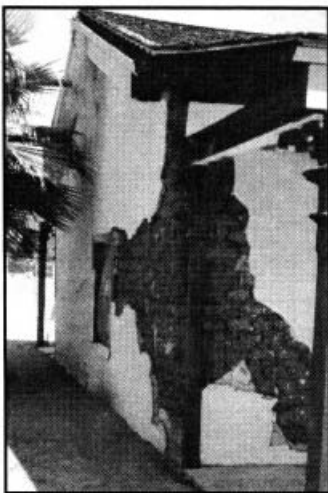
West gable-end wall. A horizontal crack extends from the south wall to the north wall. The lower section is leaning outward. This wall is very susceptible to collapse.
